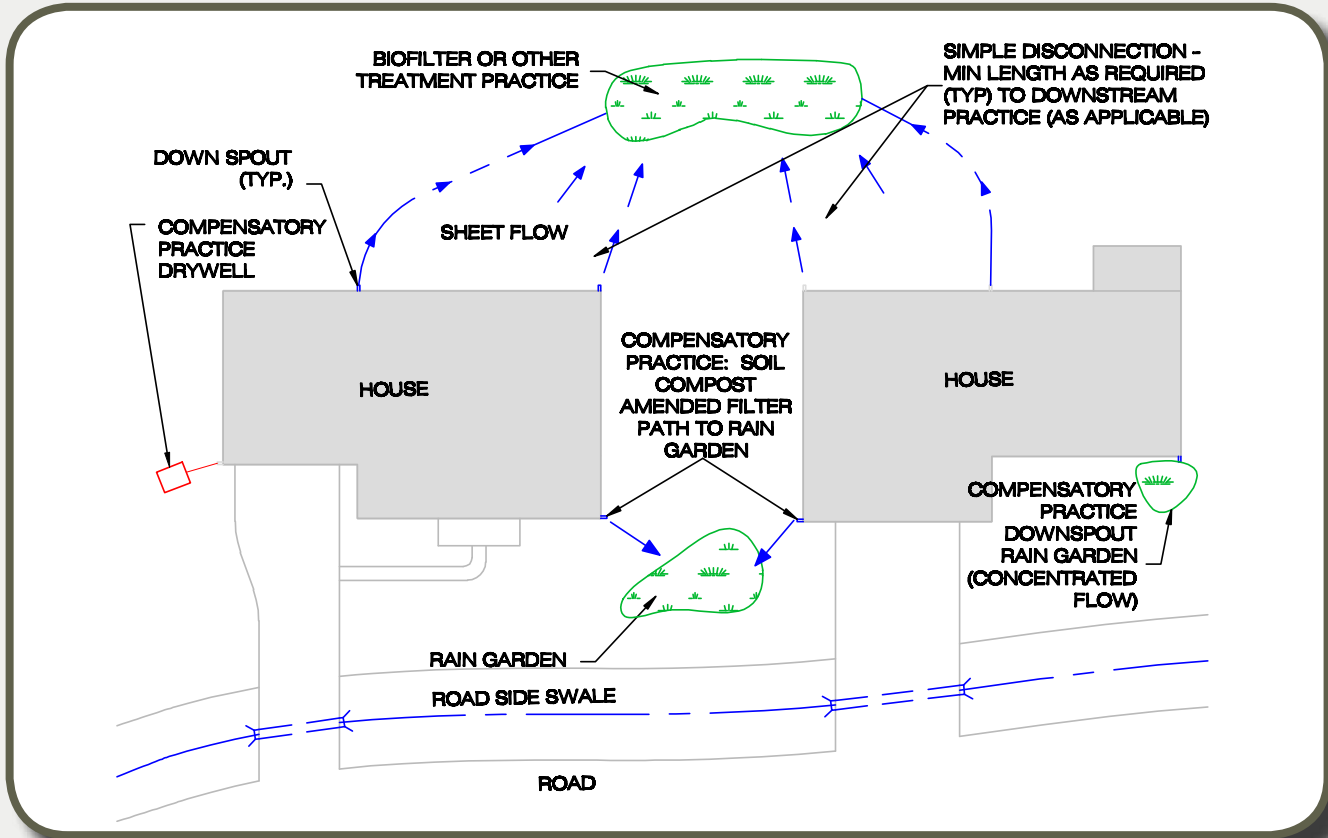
Example of Impervious Disconnection Options for Residential Rooftop: Plan View
